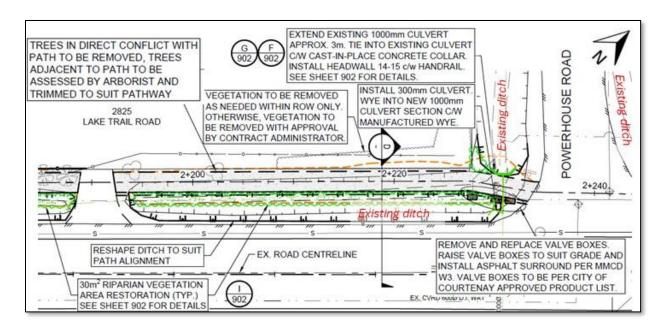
Proposed scope activities at Powerhouse Road including culvert installation and extension on the south side of the road, vegetation removal, and re-shaping the ditchline on the west side of Lake Trail Road.
